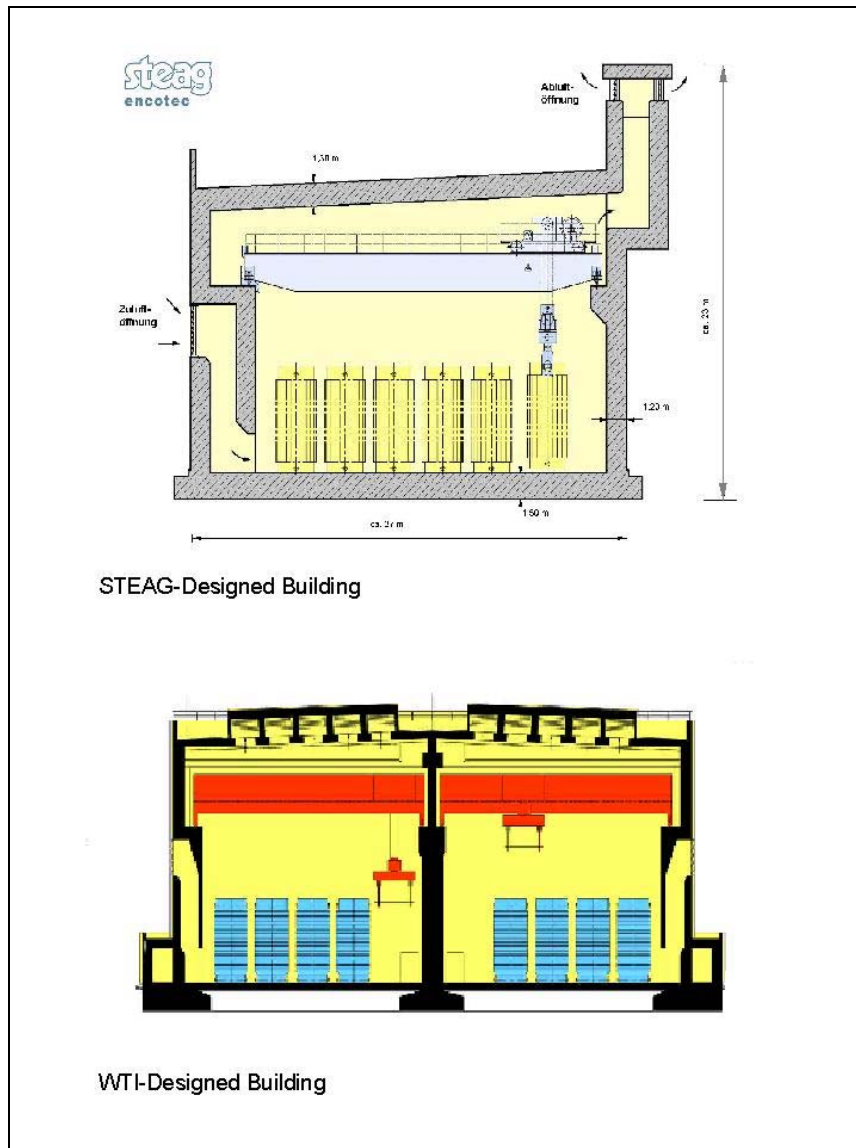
Concept Variants for On-Site Interim Storage Buildings (Cross Section)
